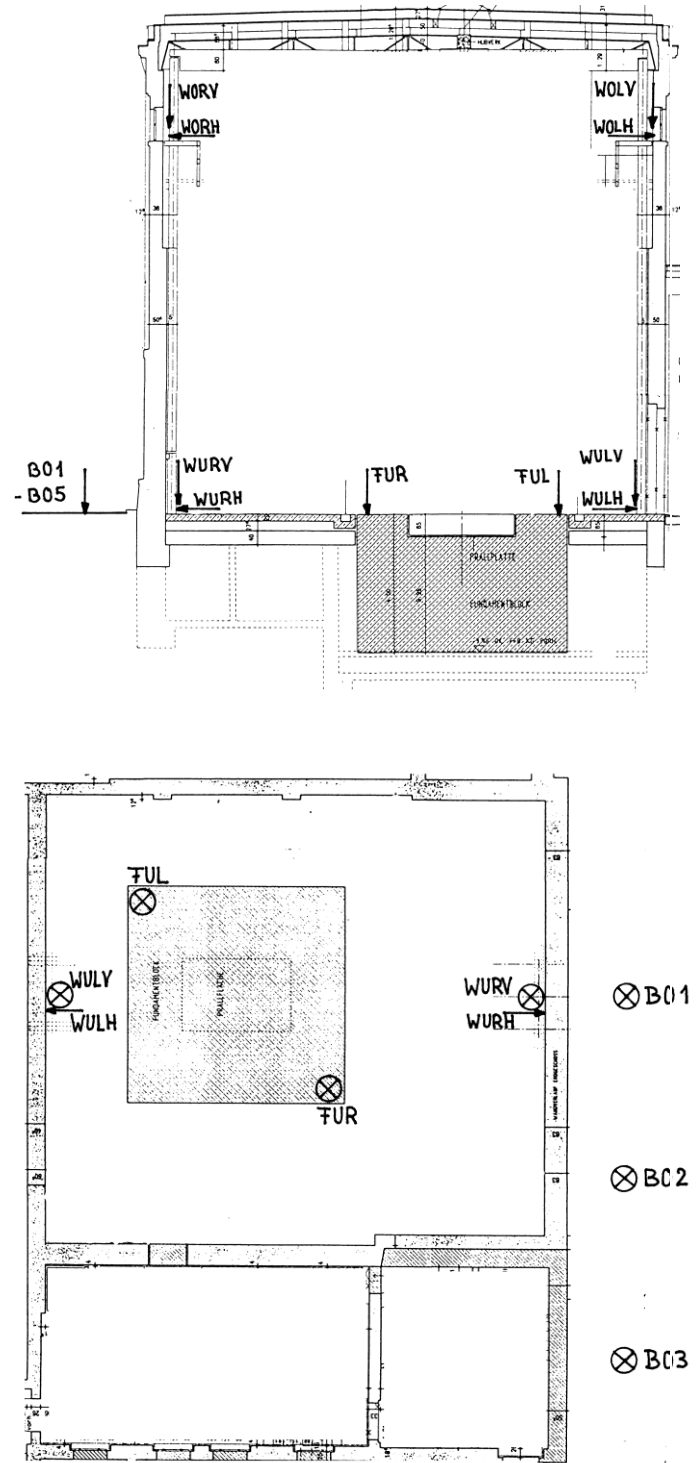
Test facility for mass drops inside a building of BAM, a) view, and b) plan with measuring points
